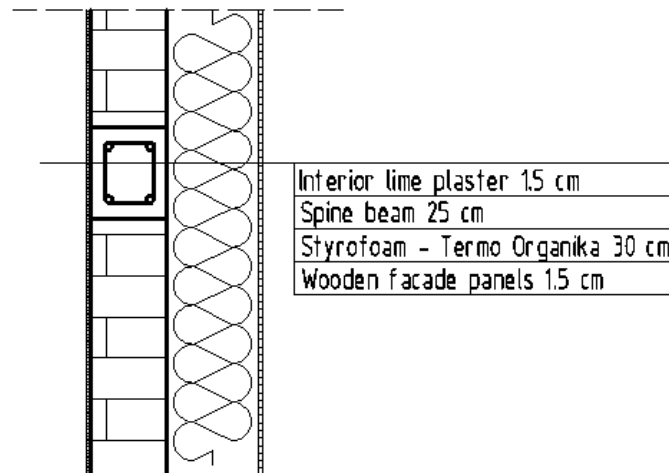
Structure of the exterior wall with the concrete beam covered with panels.
